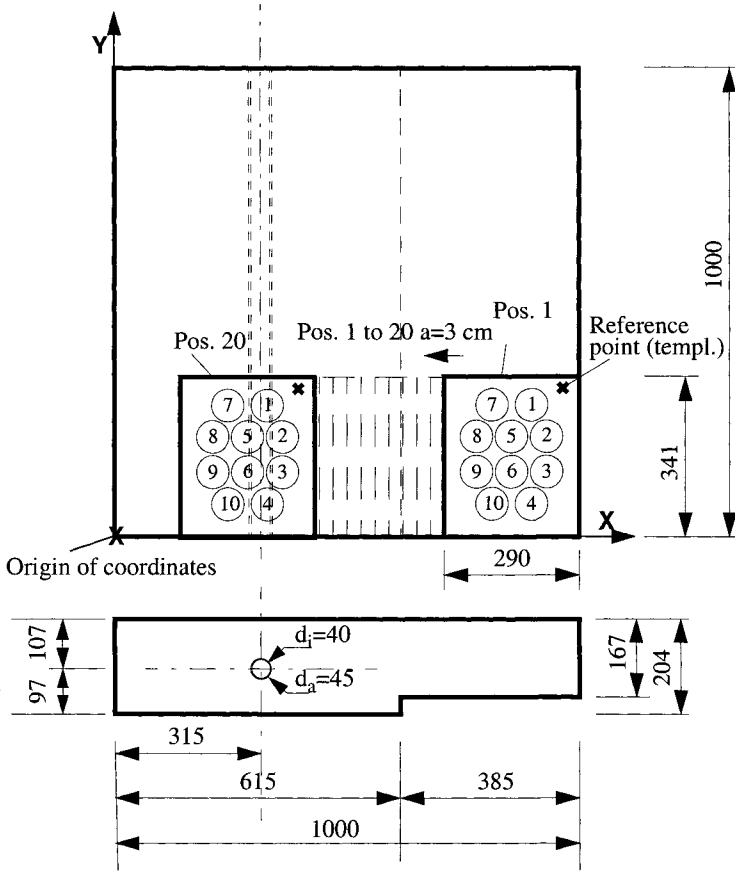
Test specimen for the application of 3D-SAFT reconstruction.
